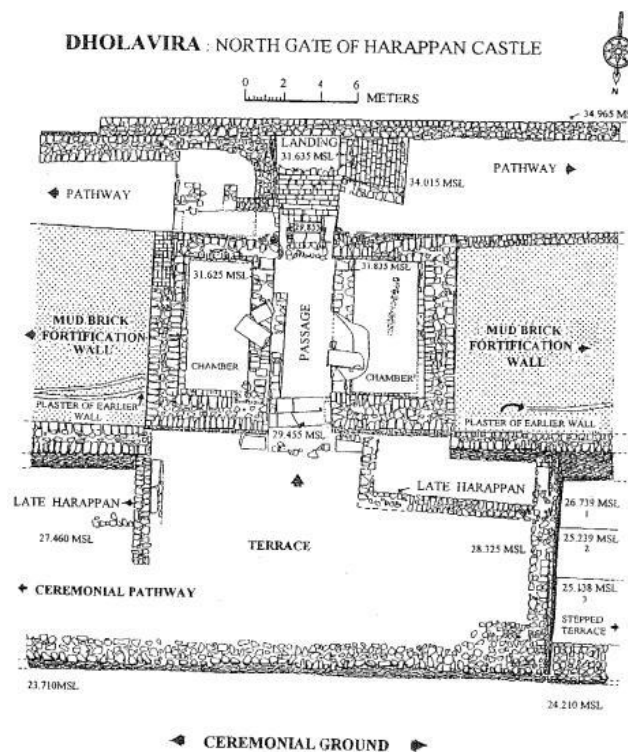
Plan of North gate Harappan Castle, Dholavira (after Bisht 1998-99, 36).
